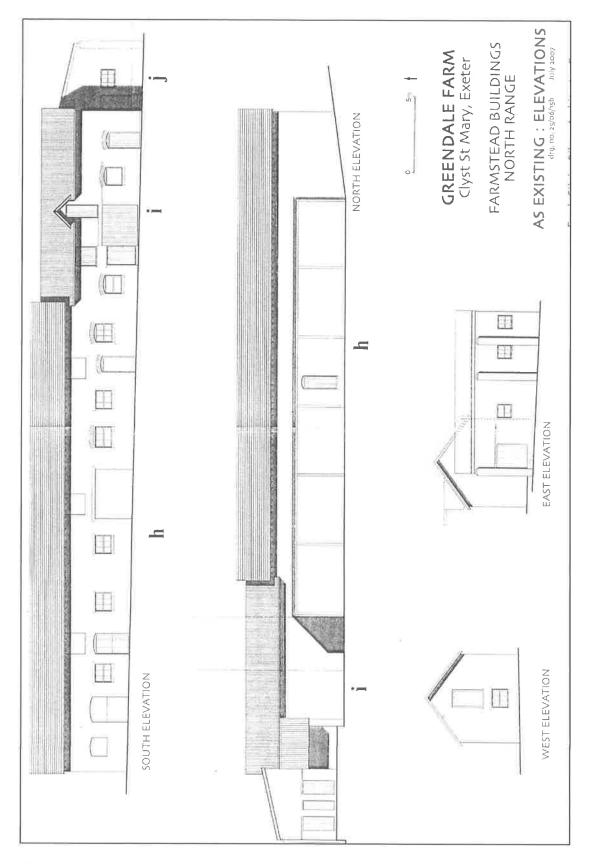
Elevations of the North-West (Building H) and North-East (Building I) ranges and the Modern Dairy (Building J).
